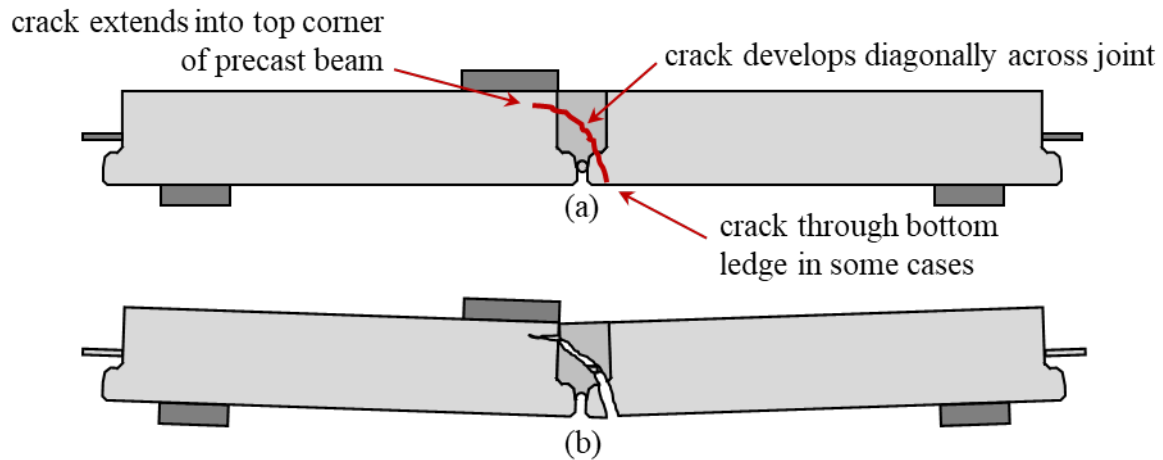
Typical failure in 12-inch-deep specimens with diagonal crack through joint: (a) cracking at failure and (b) after failure
